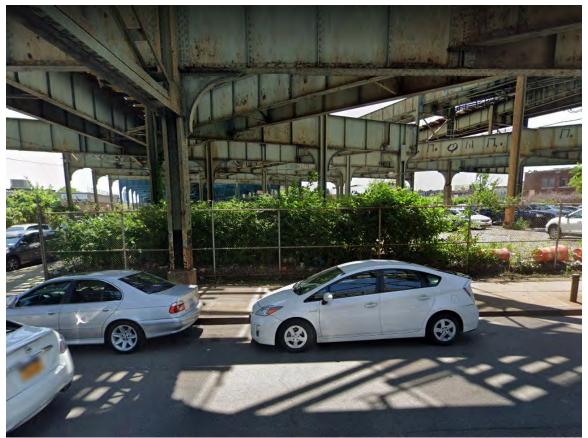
Facing north from the west side of Van Sinderen Avenue to the location of the proposed new elevated A/C to L transfer bridge. Elevated A/C Line at right.
